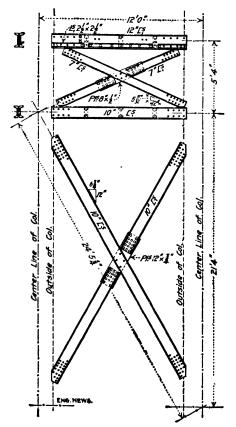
DETAILS OF WIND BRACING, SINGER BUILDING.
